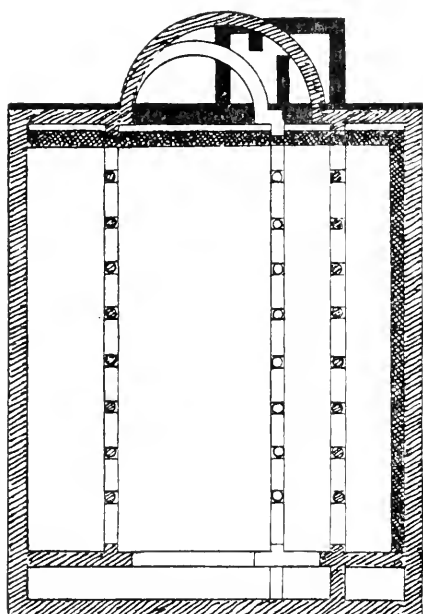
San Clemente, Rome. Groundplan, showing variety of structures.
